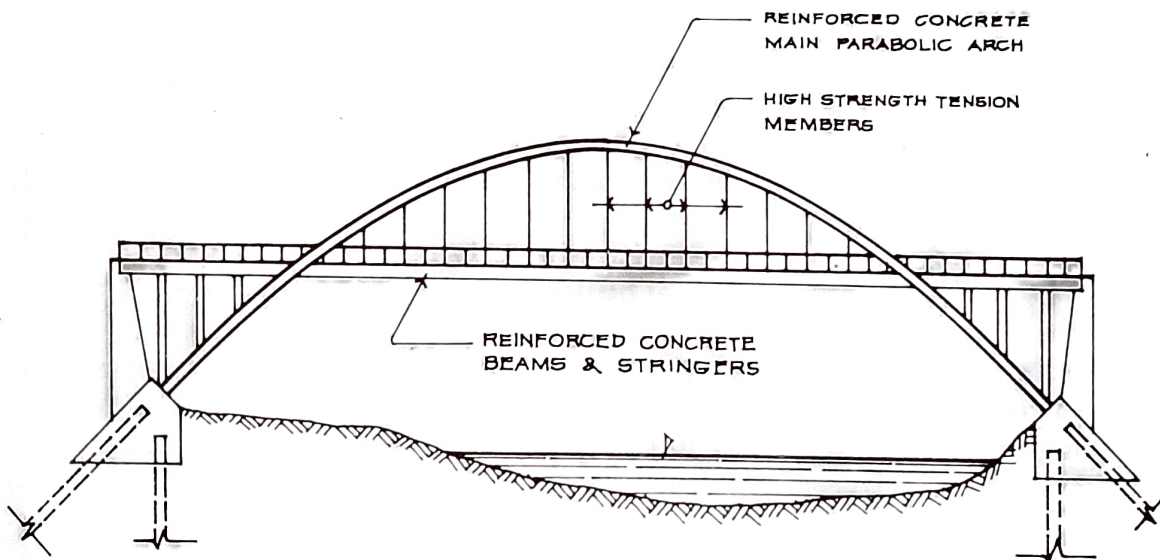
PROPOSED STRUCTURAL SCHEME FOR TAMBACAN BRIDGE, ILIGAN CITY.
